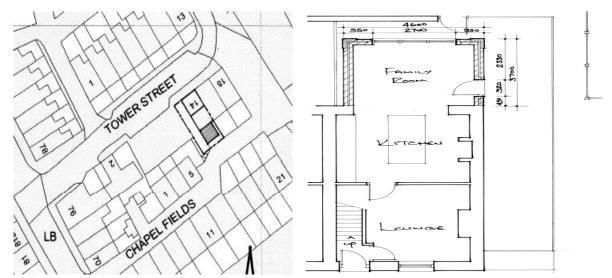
Proposed Site Plan (left) and Proposed Ground Floor Plan (right)
